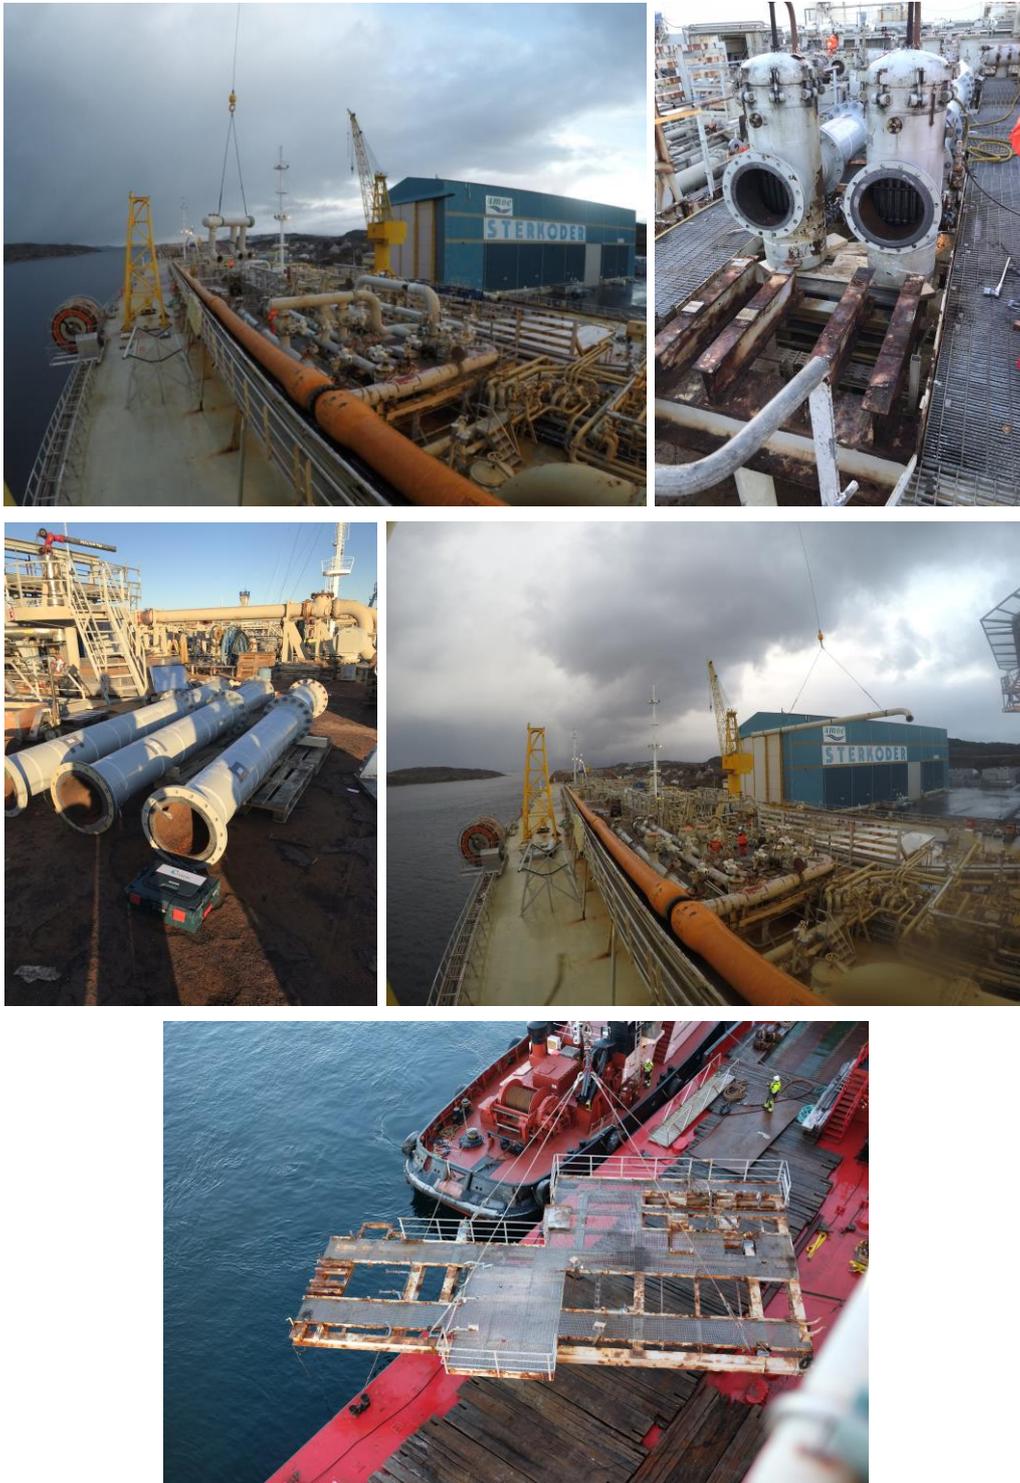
Piece-by-Piece Dismantling of the Metering Skid
